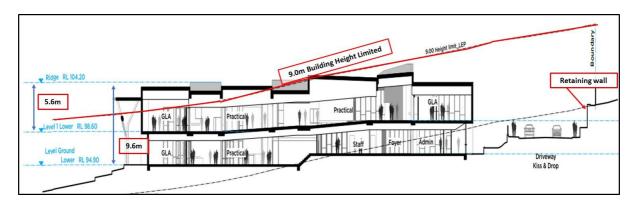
| Section through the east – west showing the driveway, retaining wall and height exceedance (Source: Applicant's EIS 2018)
